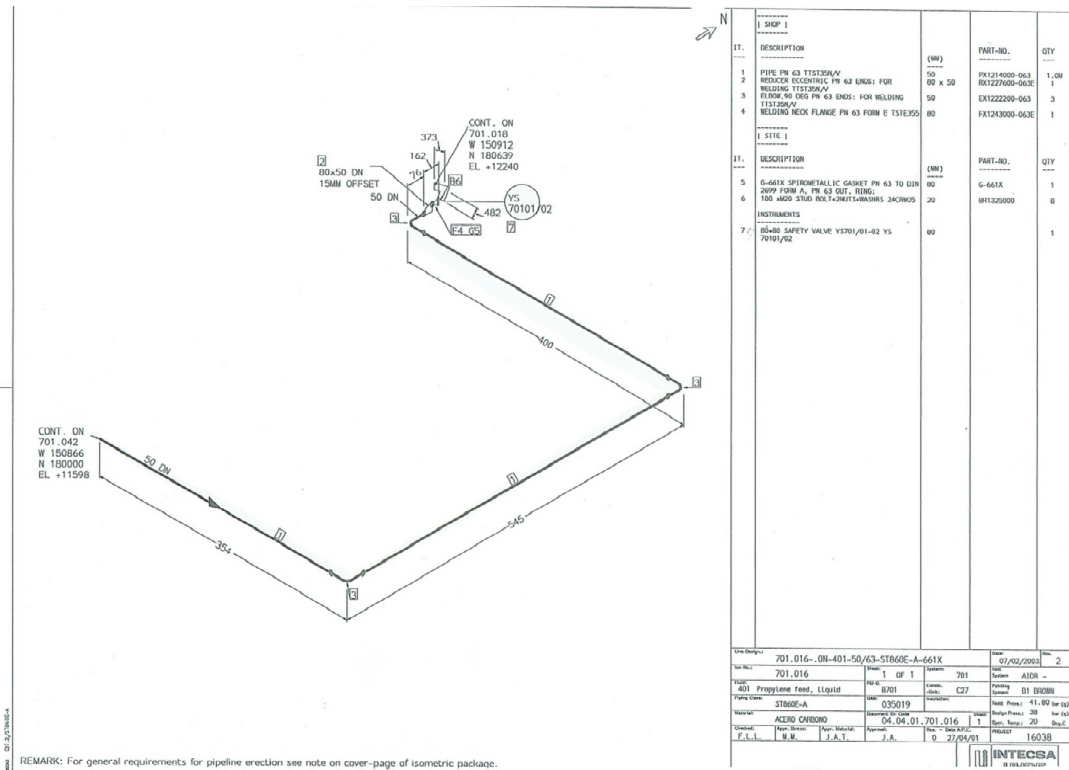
Isometric drawing of YS701-01/02 sheet 2.
